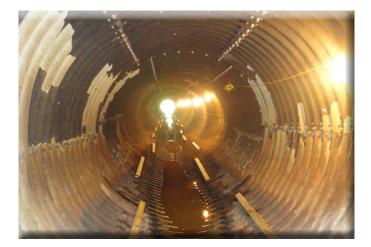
on pages 28-29 shows typical blocking of Snap-Tite[®] Culvert Liner. Blocks or skids are typically installed in a staggered pattern. Spaces are left between the blocks or skids allow grout to flow under and around the liner. Beveling skids and blocking may help faciilate easier installation of liner pipe.
